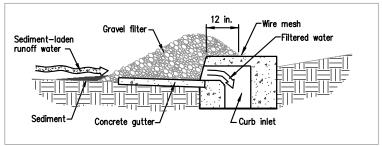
C. Cross-section detail of a gravel curb inlet protection.
